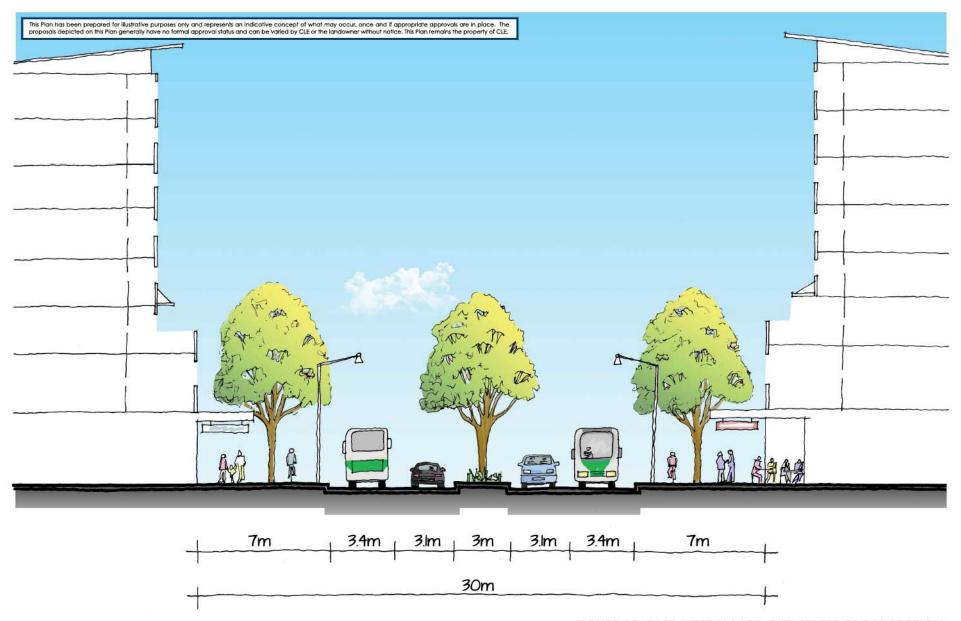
EAST-WEST MAJOR CITY STREET CROSS SECTION
